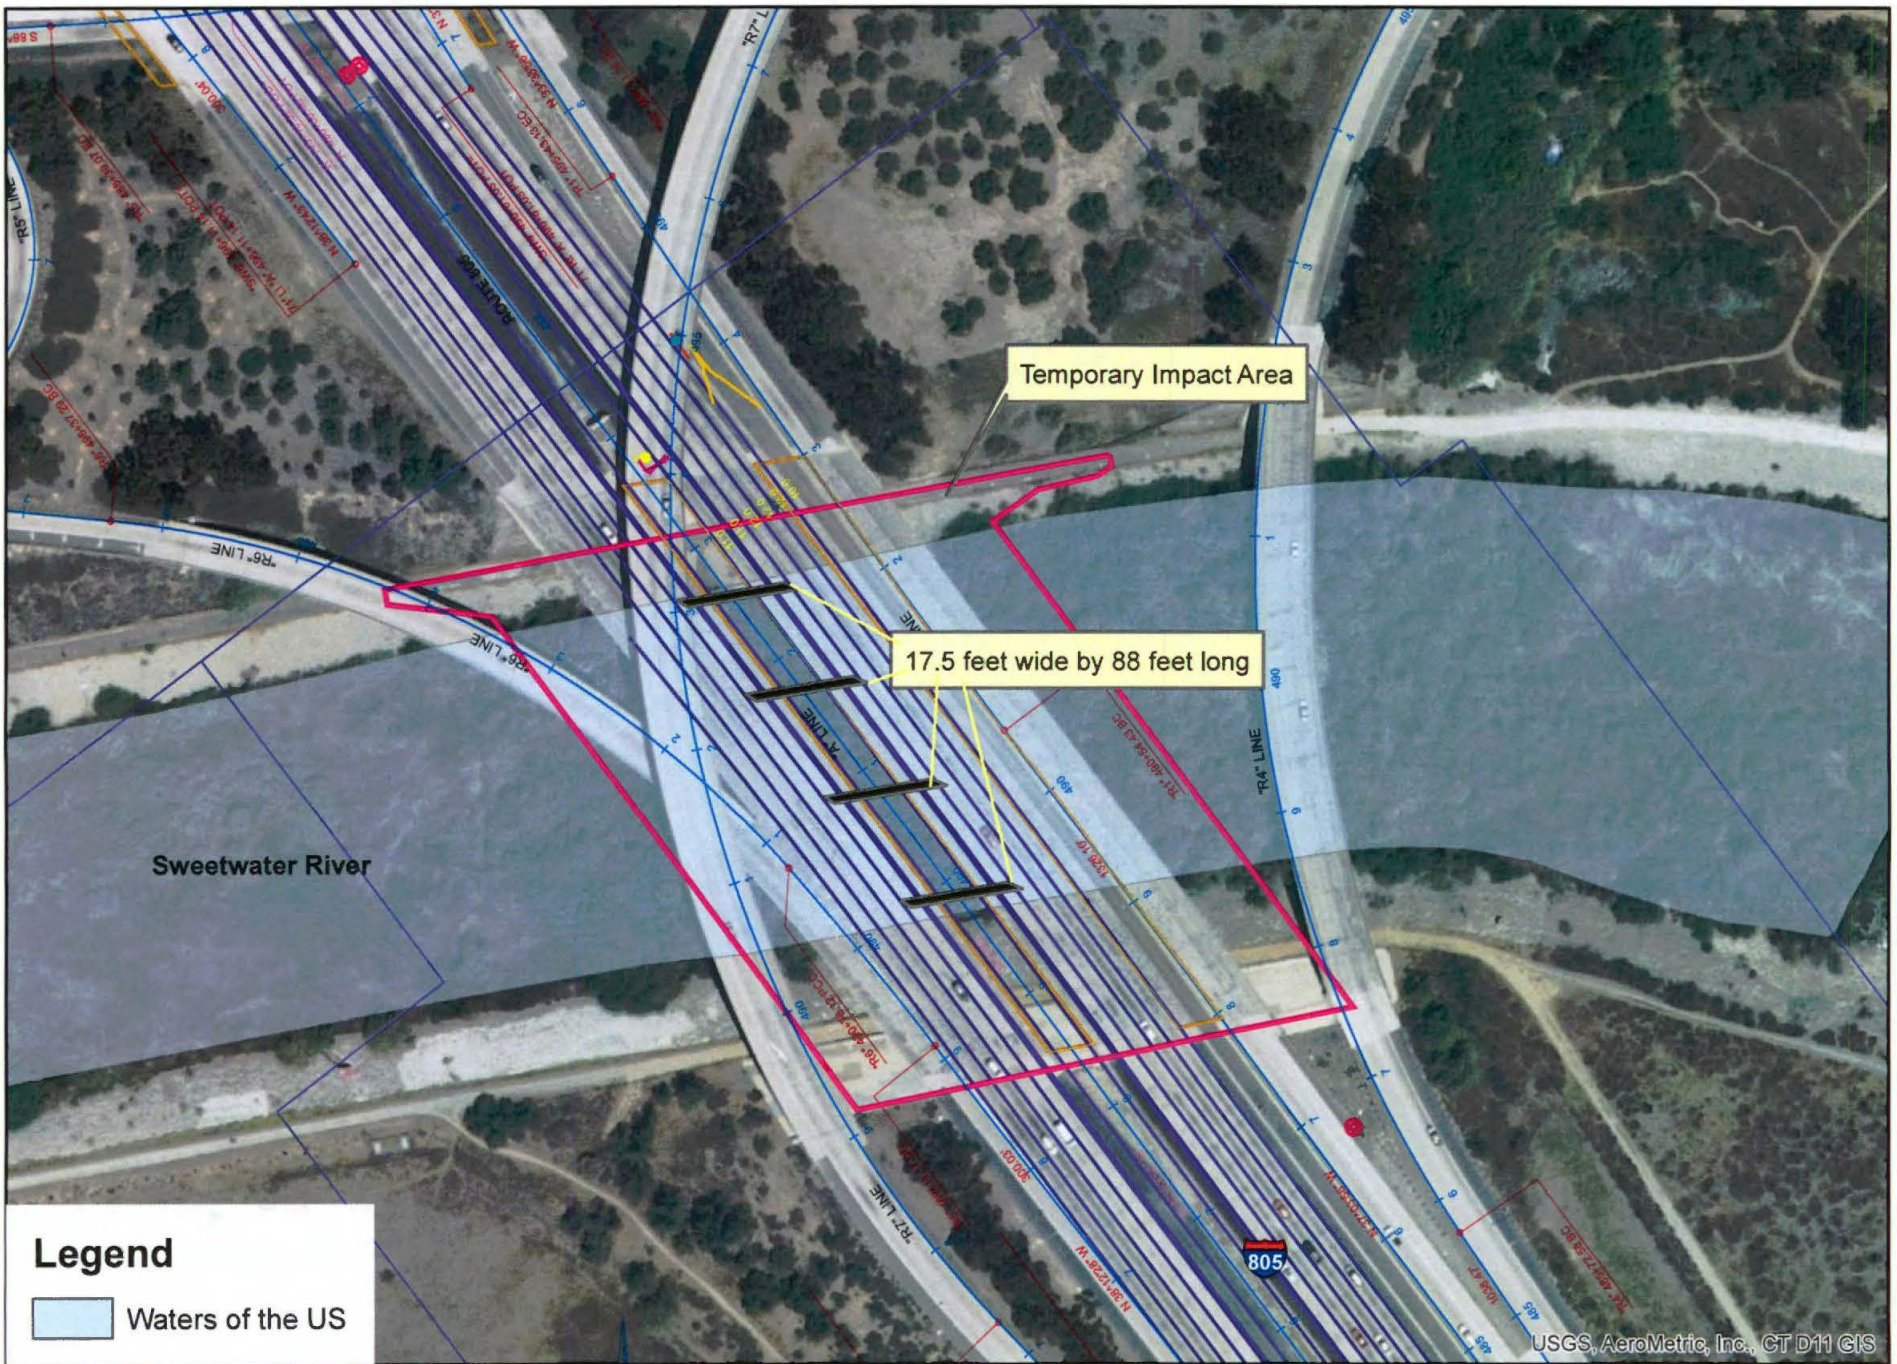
I-805 South Sweetwater Bridge Widening Impacts to Waters of the U.S.
